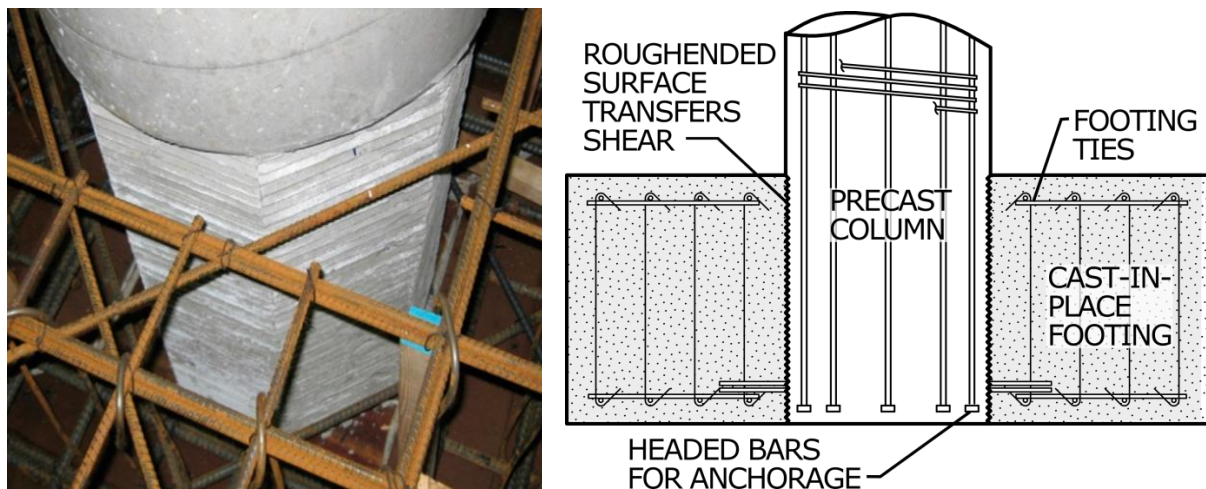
Wet-socket spread-footing connection (adapted from Haraldsson et al. 2013).
